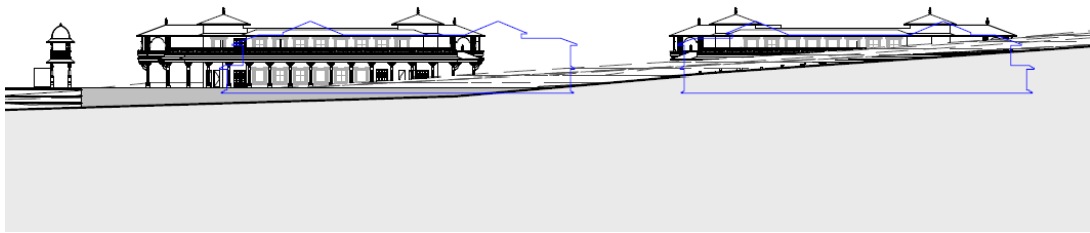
South elevation showing approved building outline (blue) and proposed amendment
